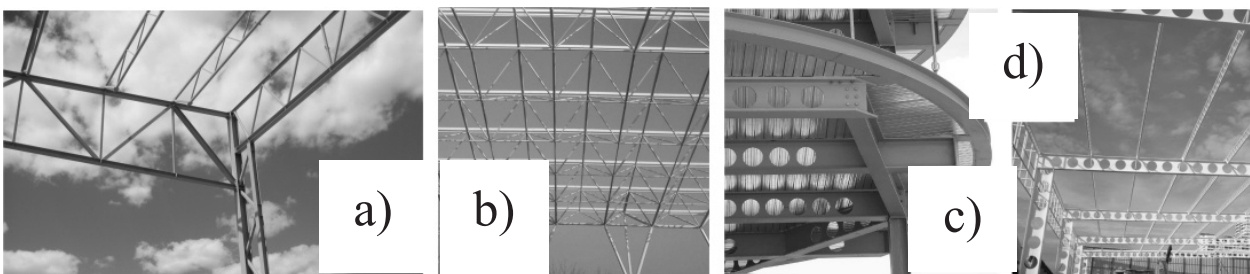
Castellated structures and trusses: a) truss beams, photo by the author; b) space frame structure (source: http://www.nilka.ro/wp-content/uploads/2015/03/crangas_2.jpg); c) castellated beams (source: http://img.archiexpo.es/images_ae/photo-g/55693-7596205.jpg); d) castellated frames (source: <https://www.slideshare.net/chagapon/cellular-beam-floor-roof-5112279>); fig. by the author.
